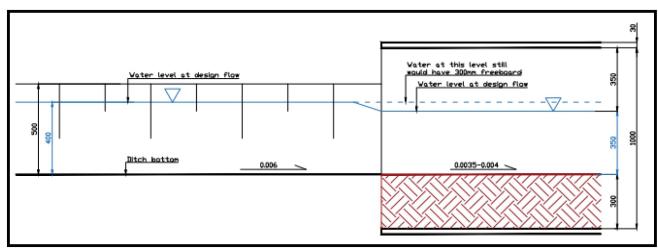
Longitudinal section of ditch-to-culvert connection
